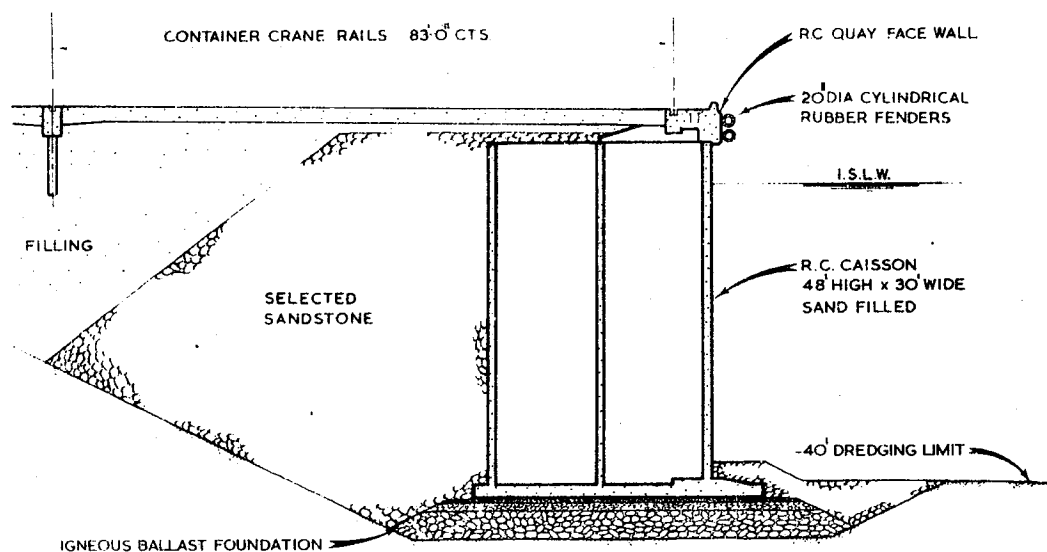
Typical Cross-Section of the Caisson Quay Wall.
